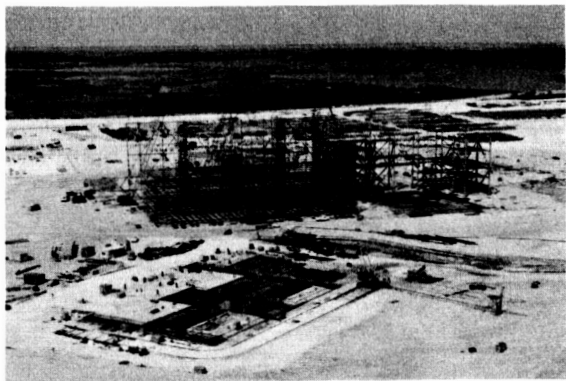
Construction of Vertical Assembly Building showing structural steel in place.
